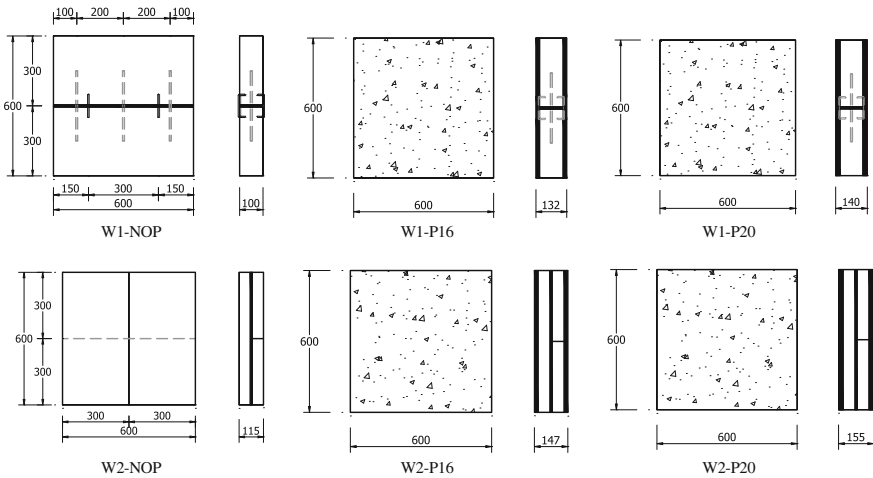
Details of wallettes fabricated using wood-wool cement composite panel (all units in millimetres)
